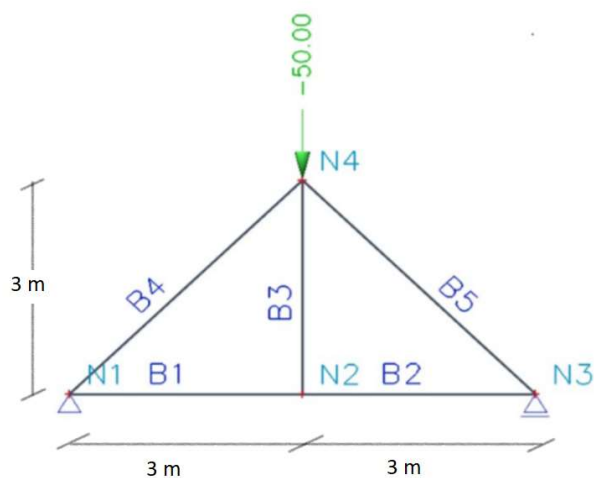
Optimal Truss Structure of Eleven Elements Truss with Naming of Nodes and Elements
